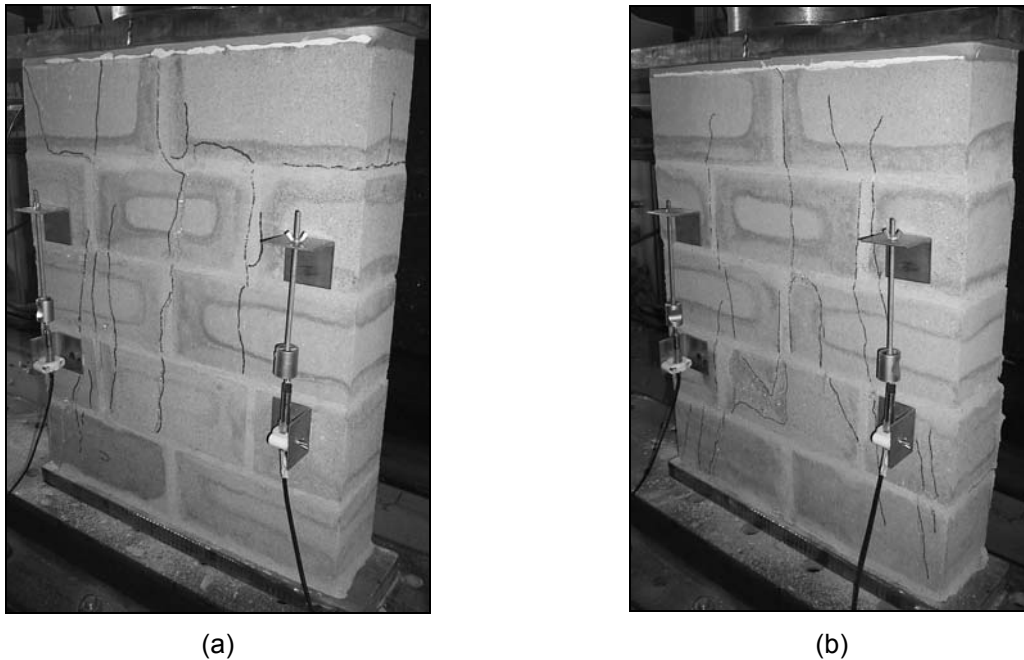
Cracking patterns on specimens built with 2C-units: specimen 2 and (b) specimen 4.
